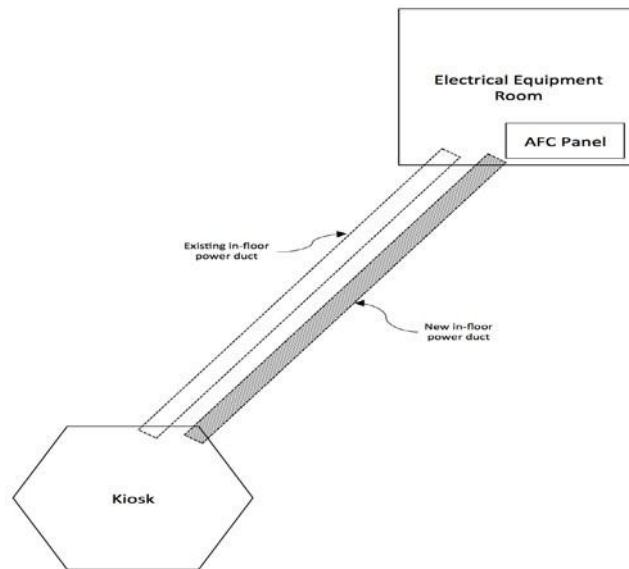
Typical New Duct Installation, Kiosk to Electrical Equipment Room (Example Schematic)
